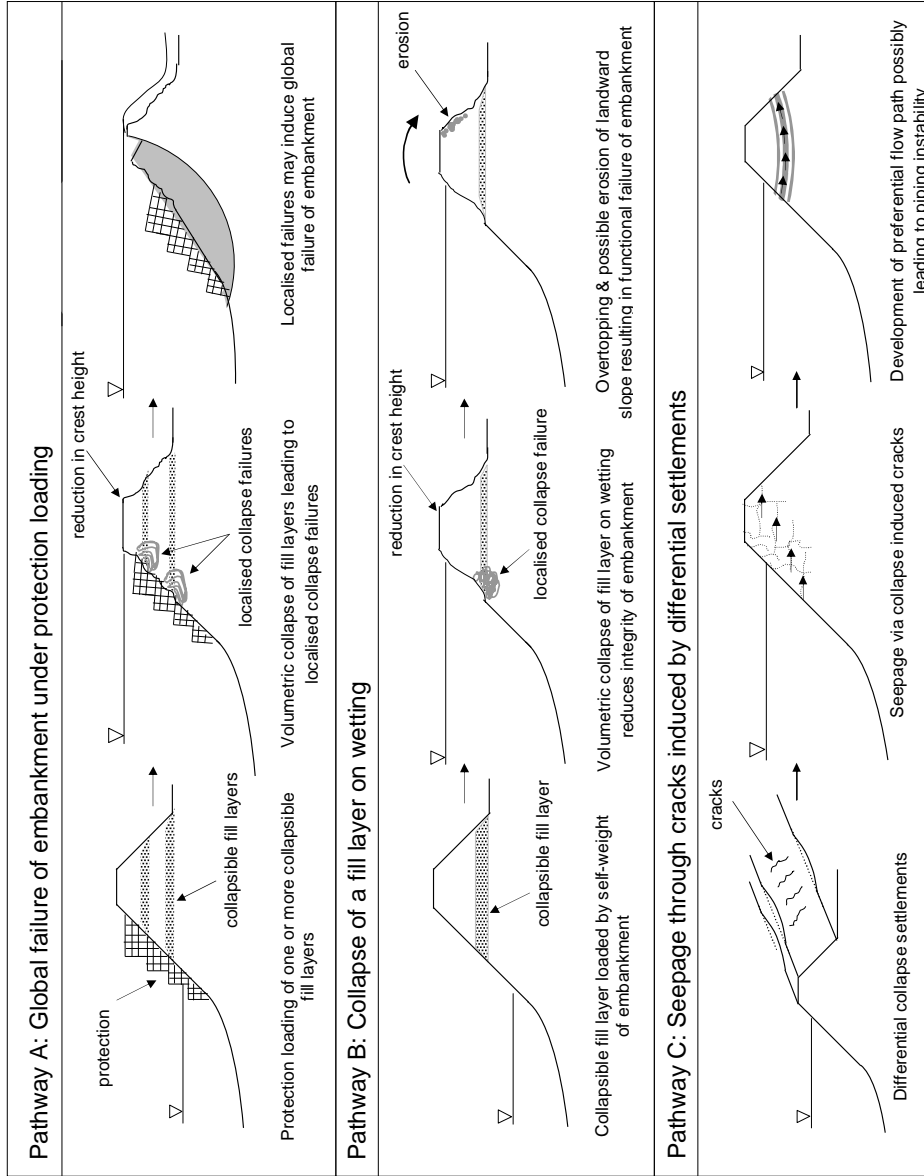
Possible failure pathways related to the presence of collapseable fill material in flood embankments, Pathway A: Global failure of embankment under protection loading, Pathway B: Volumetric collapse of a fill layer within embankment and Pathway C: Seepage through cracks induced by differential settlements
